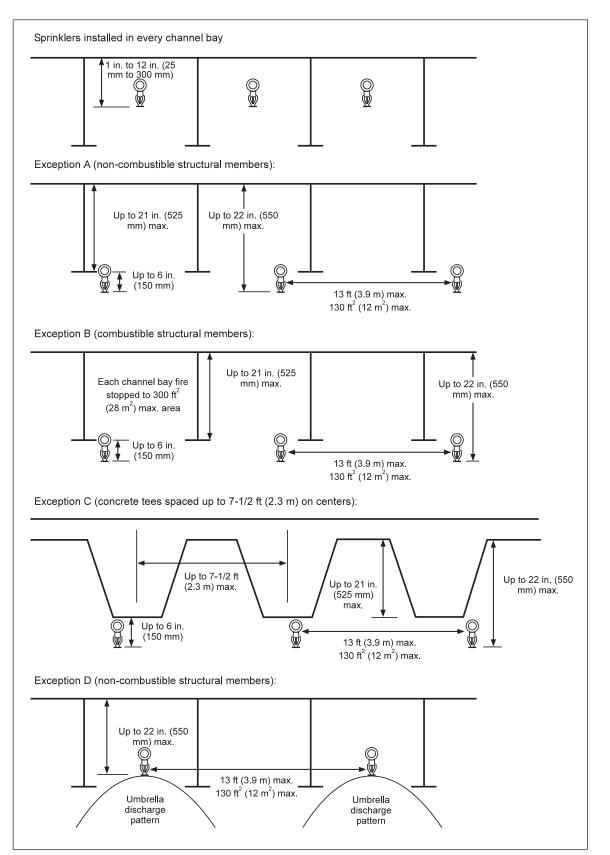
Location of Nonstorage sprinklers under obstructed ceiling construction
